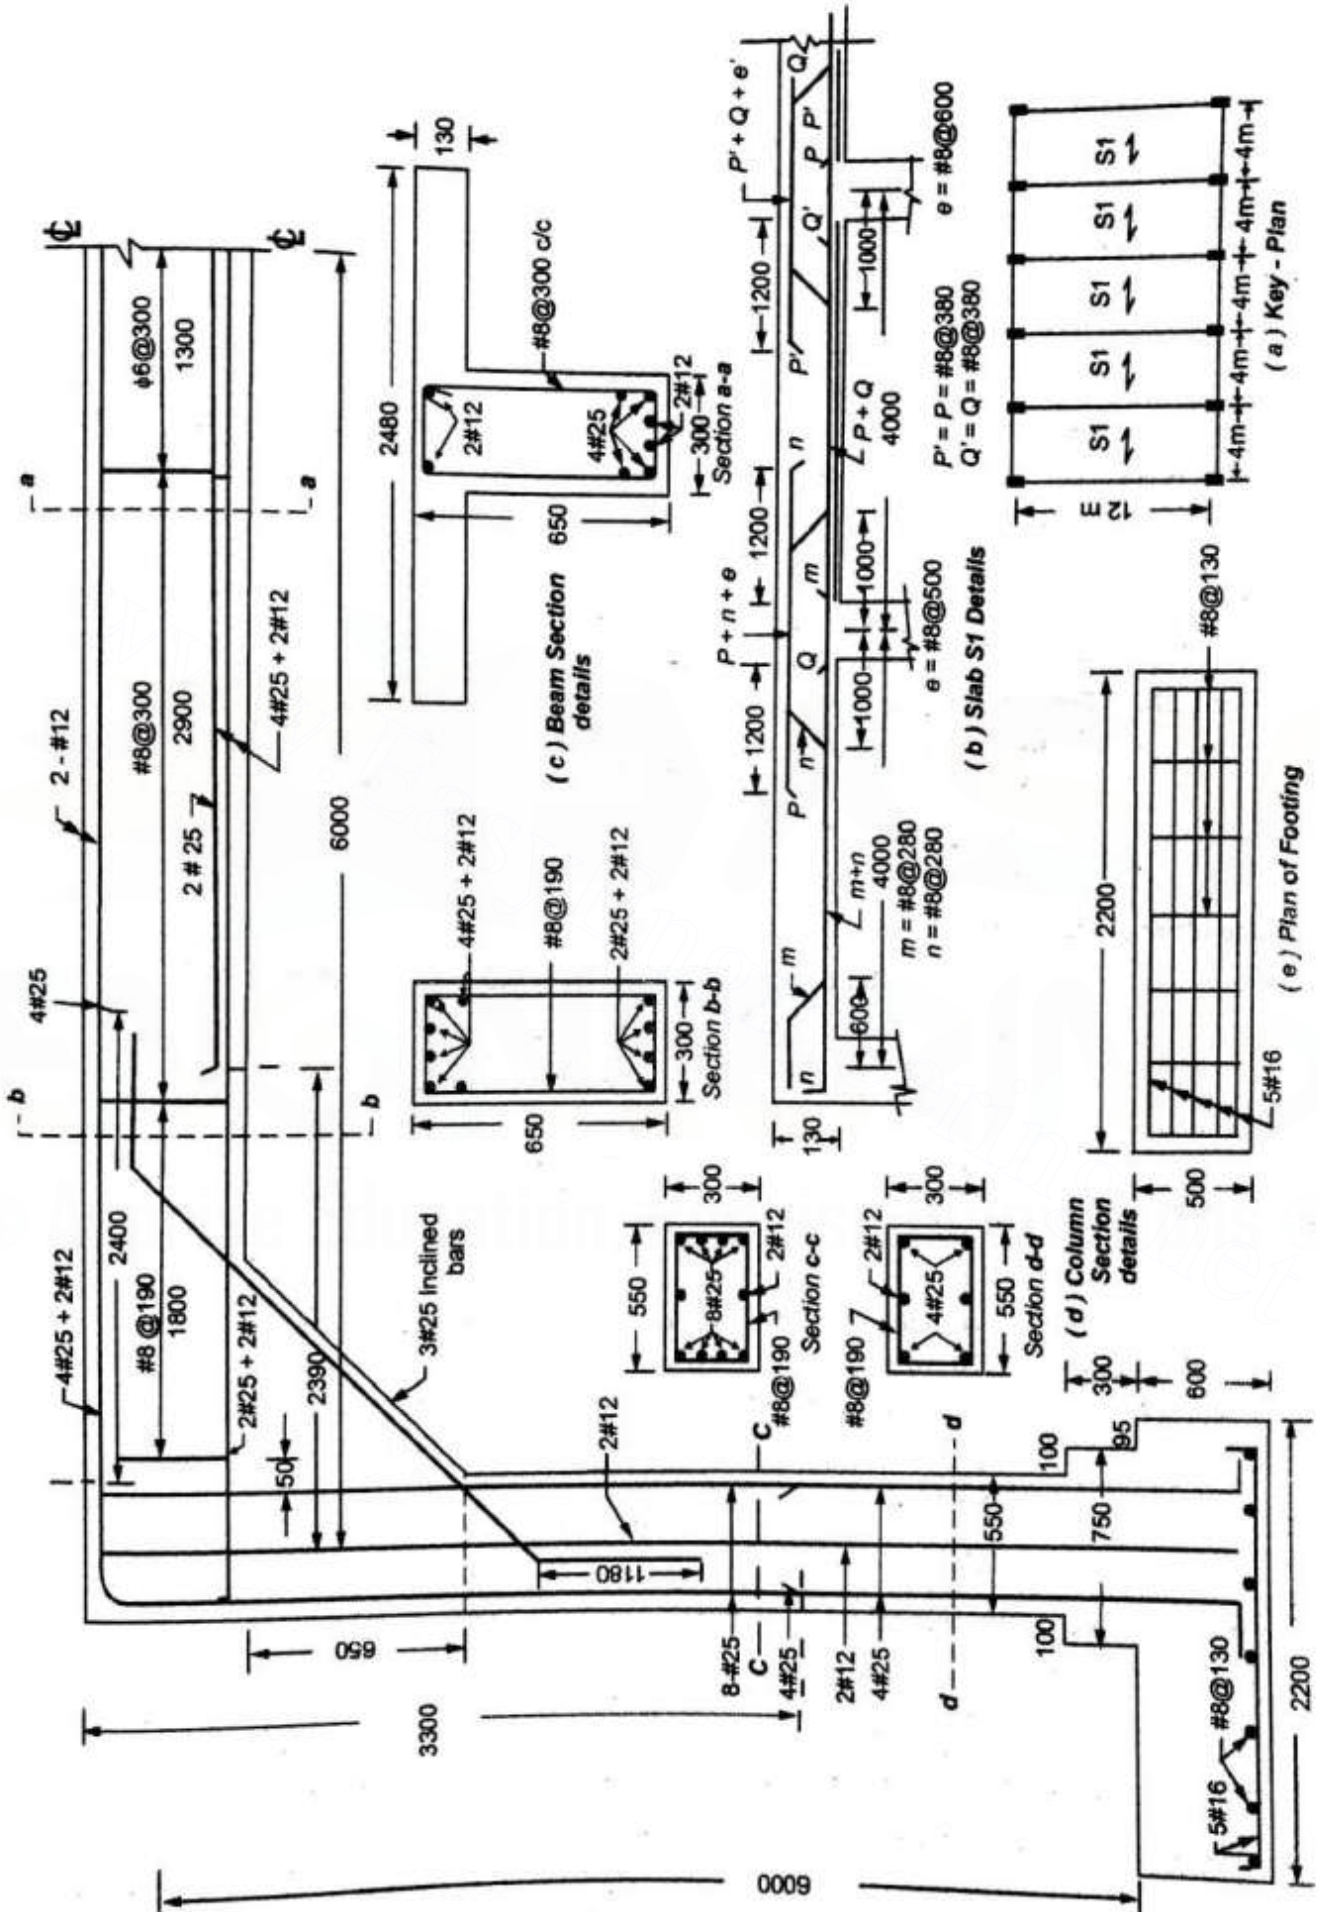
Reinforcement Details of Fixed Base Portal Frame
